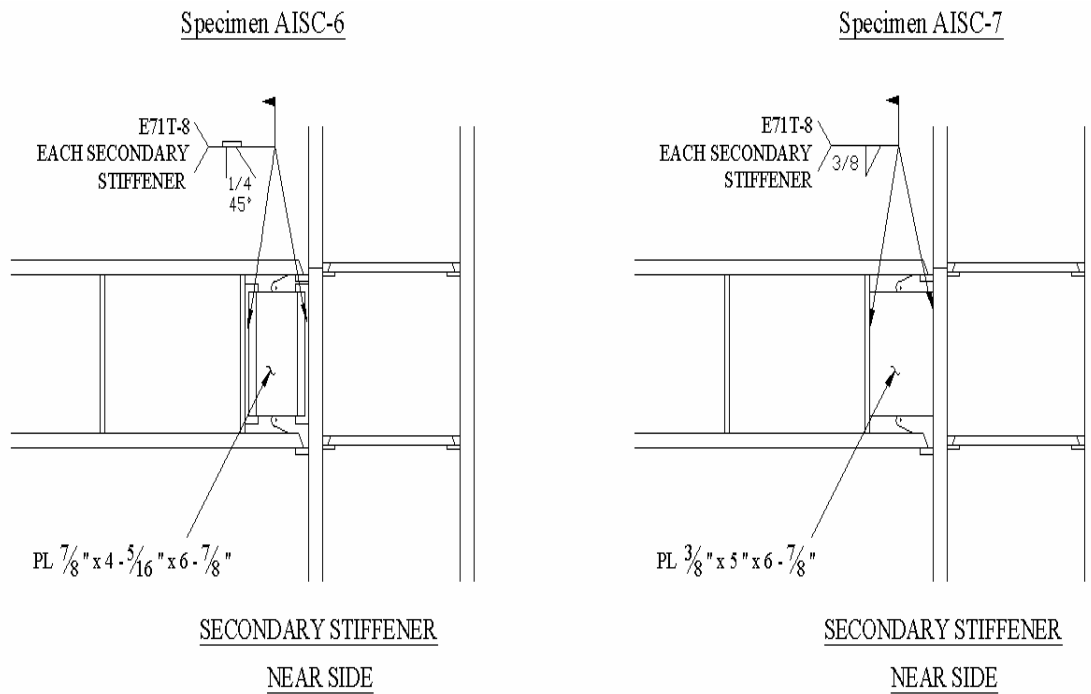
Specimens AISC-6 & 7 – Secondary Stiffener Detail
